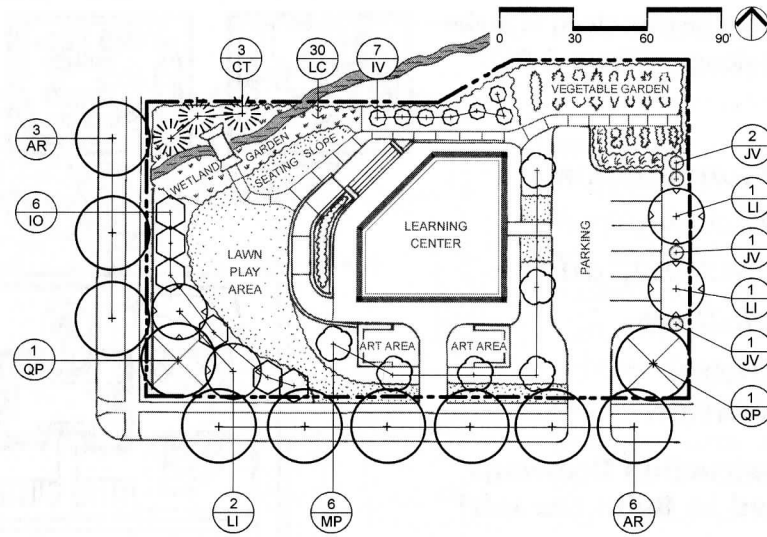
Planting plan. (COURTESY OF BARBARA SIEGEL RYAN.)
